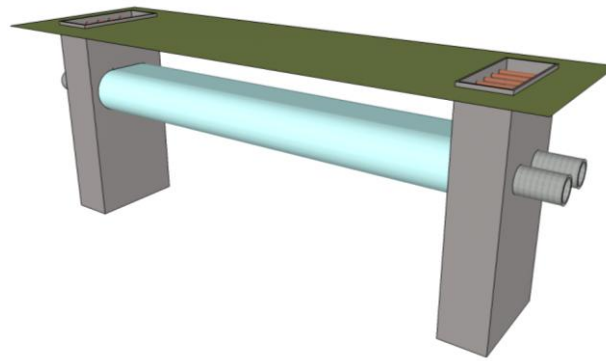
Freezing the soil body surrounding the tunnel tubes
